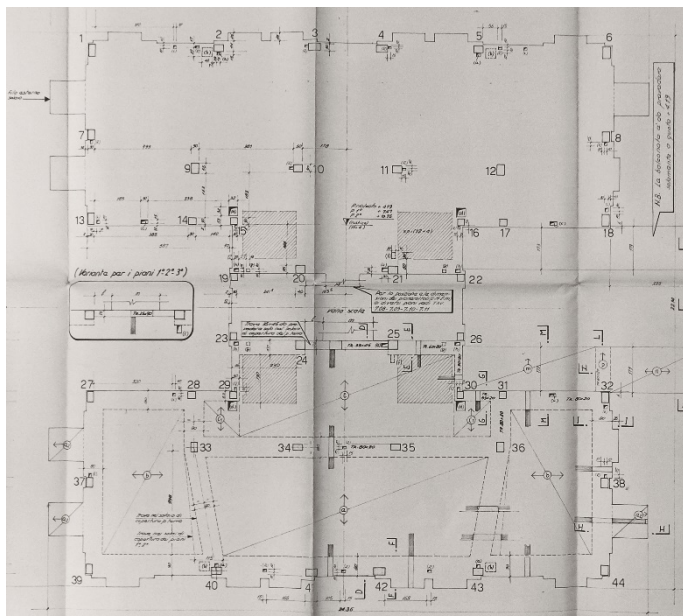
Bottom structural floor plan (detail 1:50) adopted in blocks B2 by Borini (ATC, 14563).
